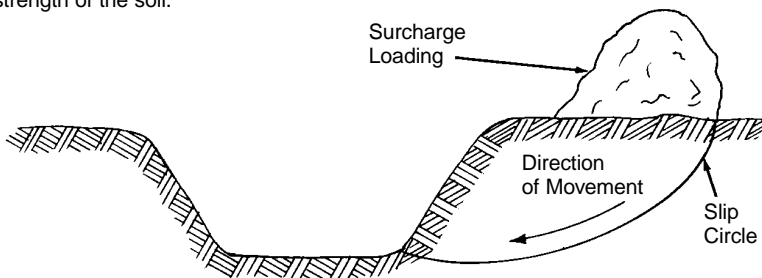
Typical trench wall failure in cohesive soil
